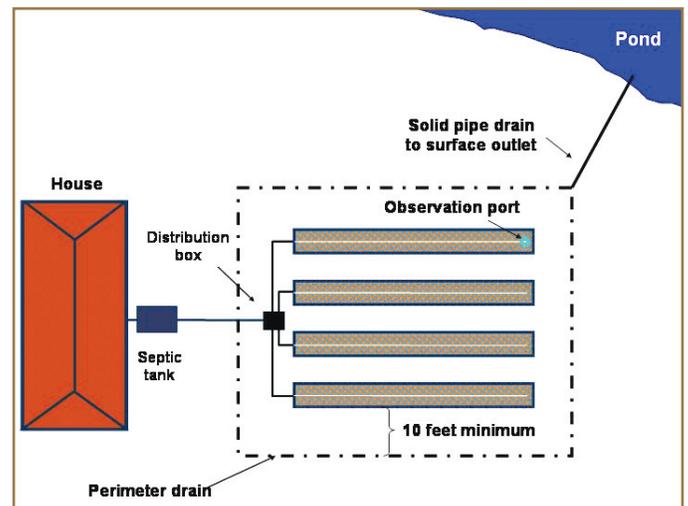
A perimeter drain is constructed of perforated polyethylene pipe placed at the bottom of a gravel-filled trench surrounding a septic system soil absorption field. A junction is installed at the lowest elevation of the perimeter drain trench and the drain is connected to a solid pipe to transport water to a nearby ditch, stream, or pond, or to a lower part of the lot.
